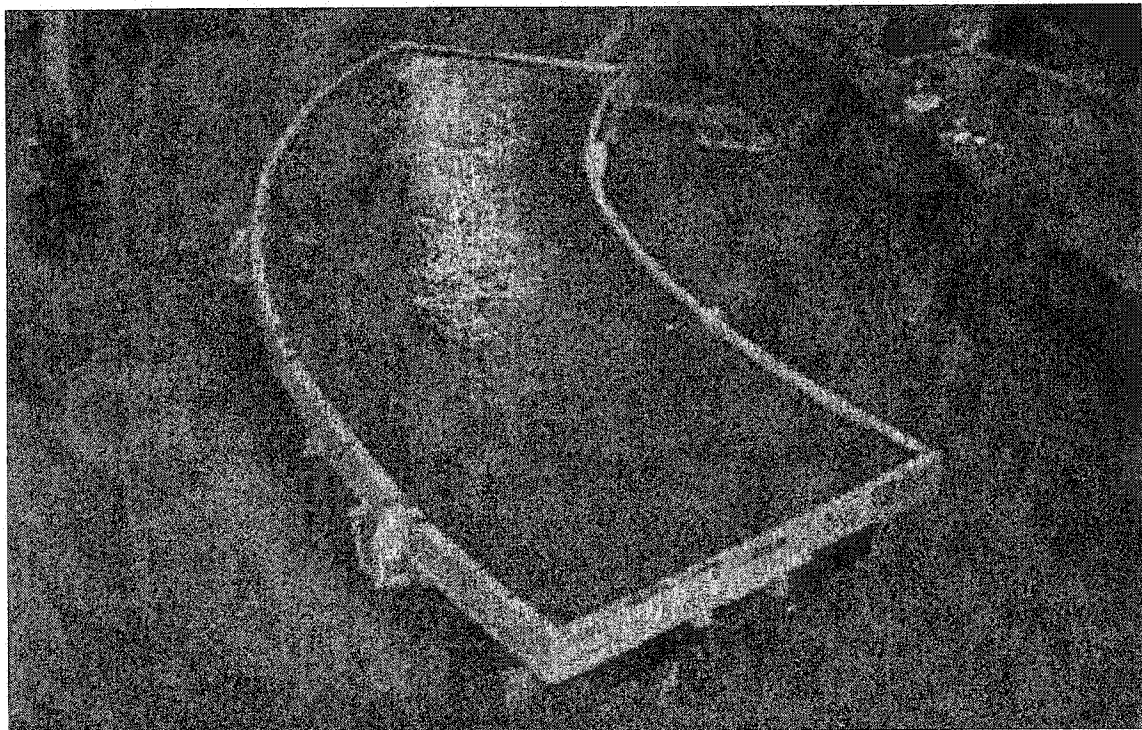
View of Bridge Model M2 after pouring and finishing the concrete slab
